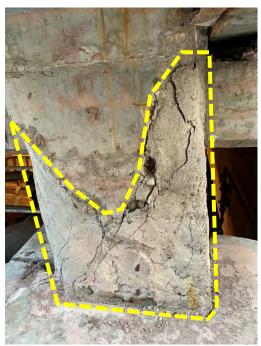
Cracked and unsound previous concrete repair at Column 10A. Eight grout pockets are visible at the ends of the beam PT tendons.
